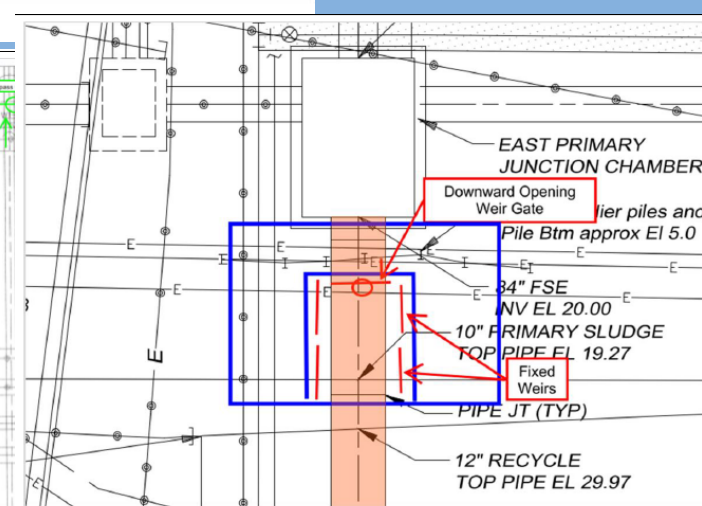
Proposed Layout-Alternative E (East Plant Splitter Structure)
